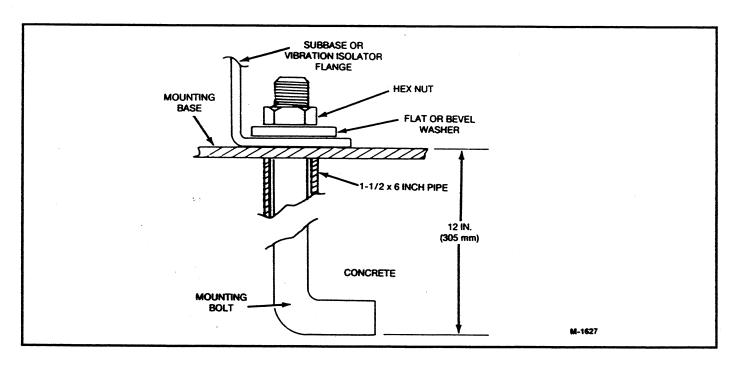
TYPICAL ANCHOR BOLT DIAGRAM
